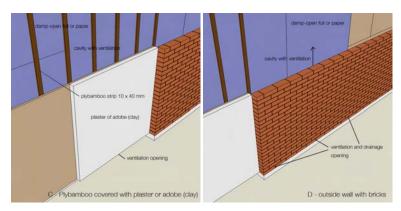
Expanding wall system with plaster and brick cover. (Structure C and D)
